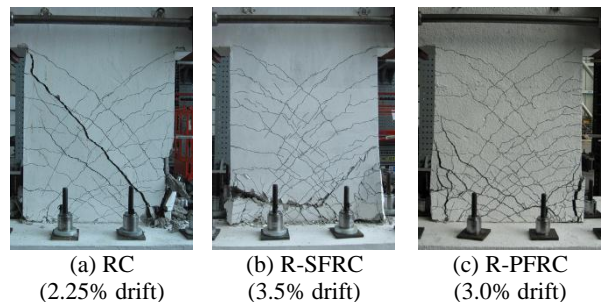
Failure cracking patterns for different concrete walls.
